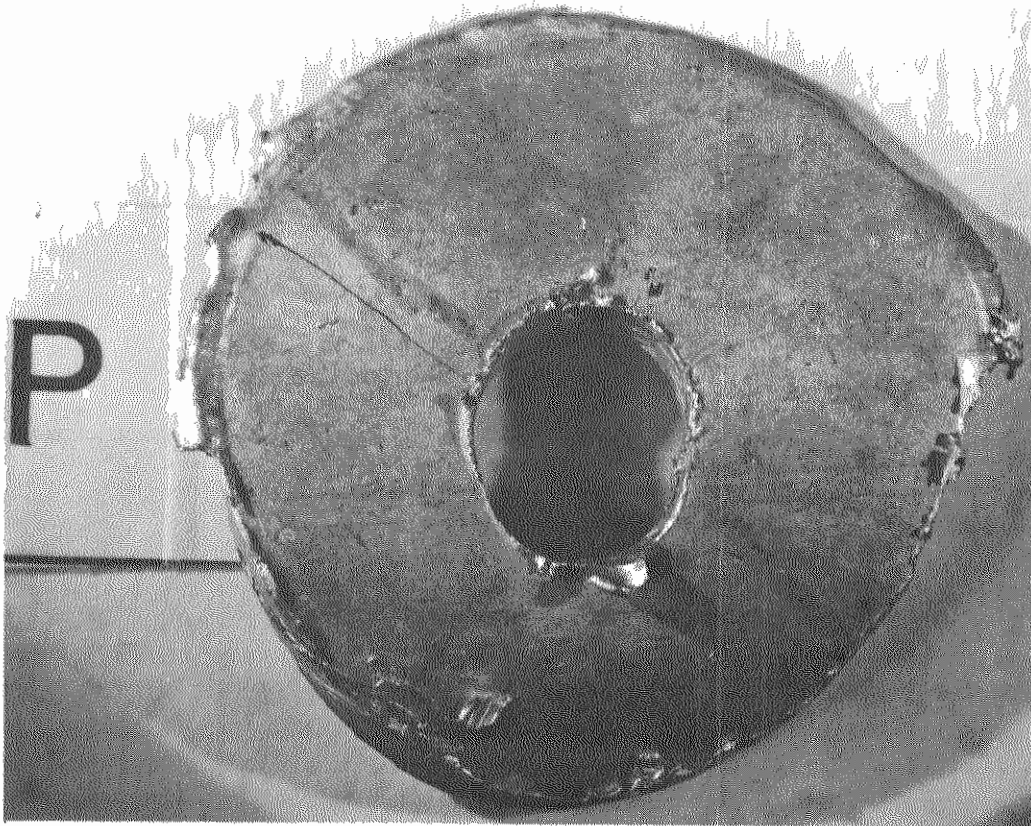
Typical 1-1/8 in. sample disc cut from culverts.
